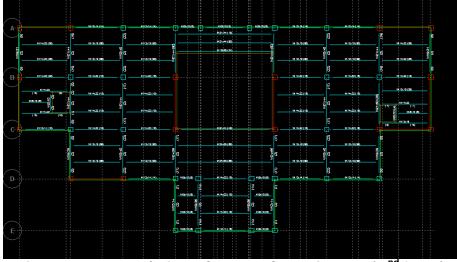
Beam / Girder Strength Check in RAM ( 2<sup>nd</sup> floor )
